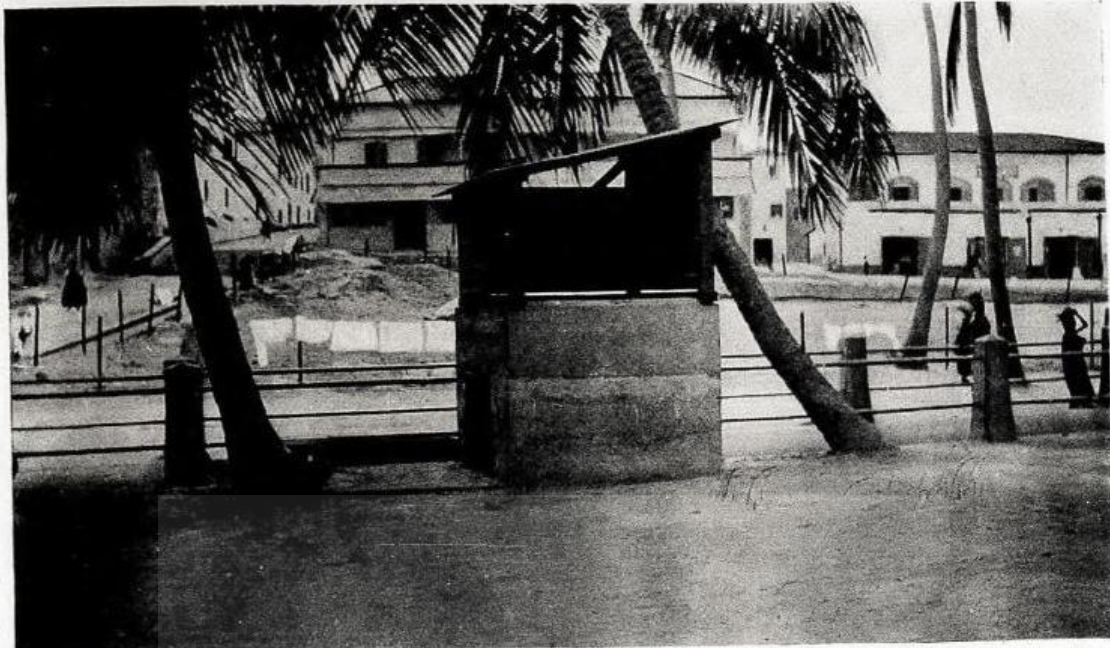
Concrete Dustbin, with concrete raking platform. Too high for goats and fowls to get in. (For plan see Appendix Q.)
